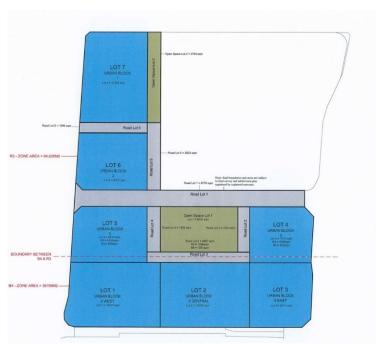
Approved Master plan concept subdivision plan DA-14/96
